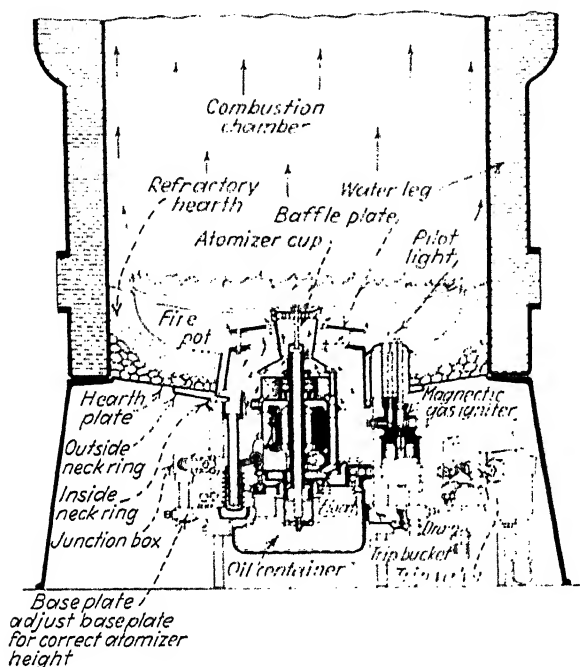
Details of commercial vertical-shaft centrifugal-type oil burner.
